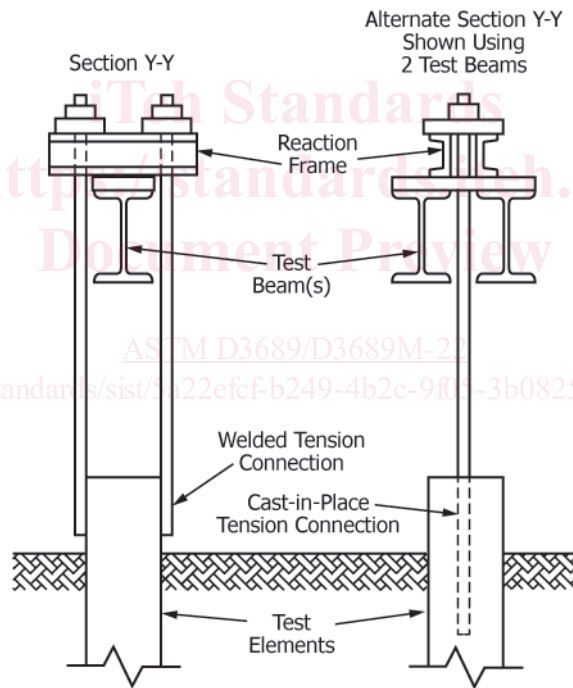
Typical Section Y-Y (Fig. 4, Fig. 6) of Test Beam(s) at Test Pile Element(s)
